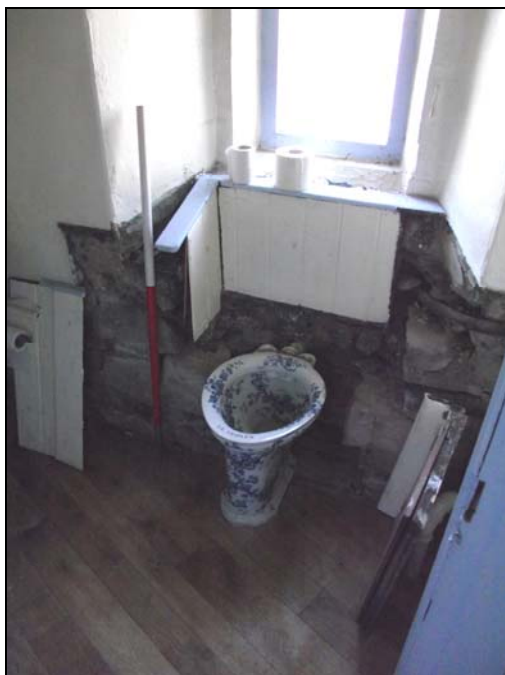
, 90: room 3, view of the decorative *Vestry* toilet, from the southwest
